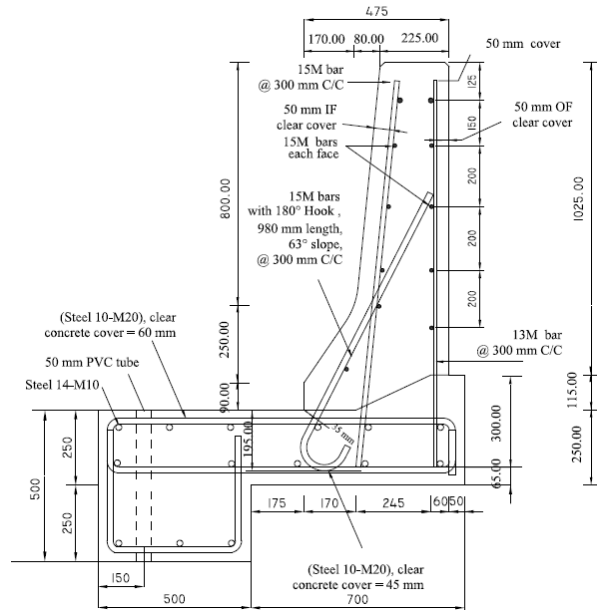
Specimen B-1 for interior portion with hook facing outward at 300 mm spacing
